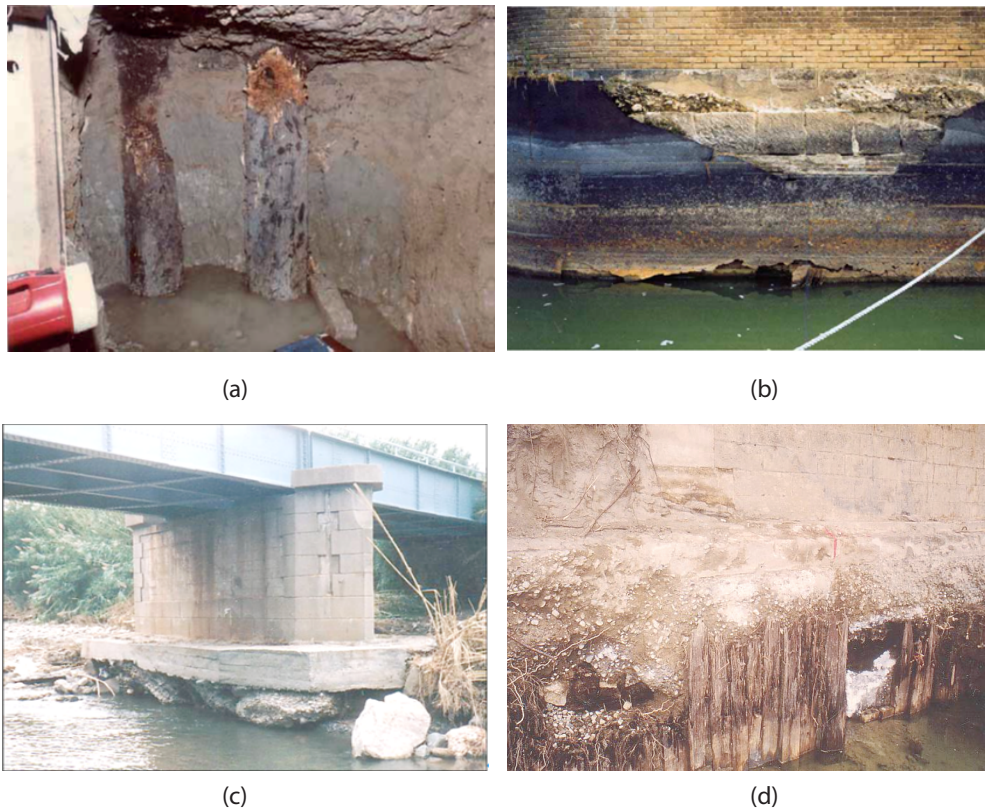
Photos of damages on foundation: (a) rotten timber piles; (b) corrosion of caisson; (c) local scour; (d) loss of scour protection (SNCF, 2005).
